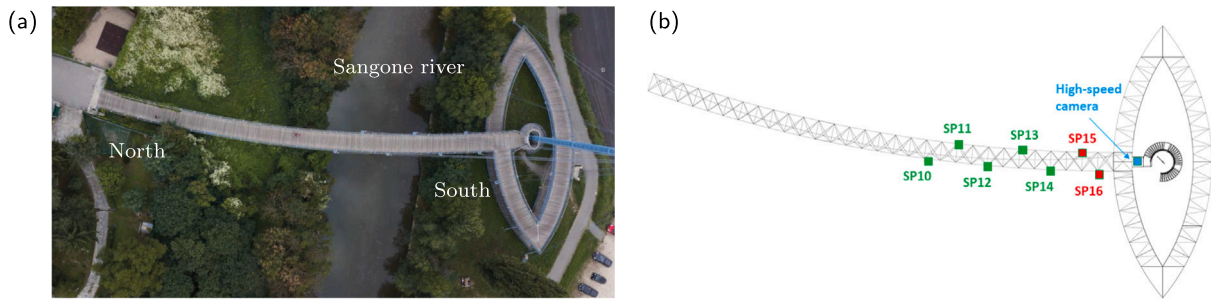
Footbridge Albano Zuin in Beinasco (Italy): (a) aerial view of the cable-stayed pedestrian bridge, (b) plan view of the bridge, anchorage points of the seven cables supporting the deck and position of the high-speed camera.
